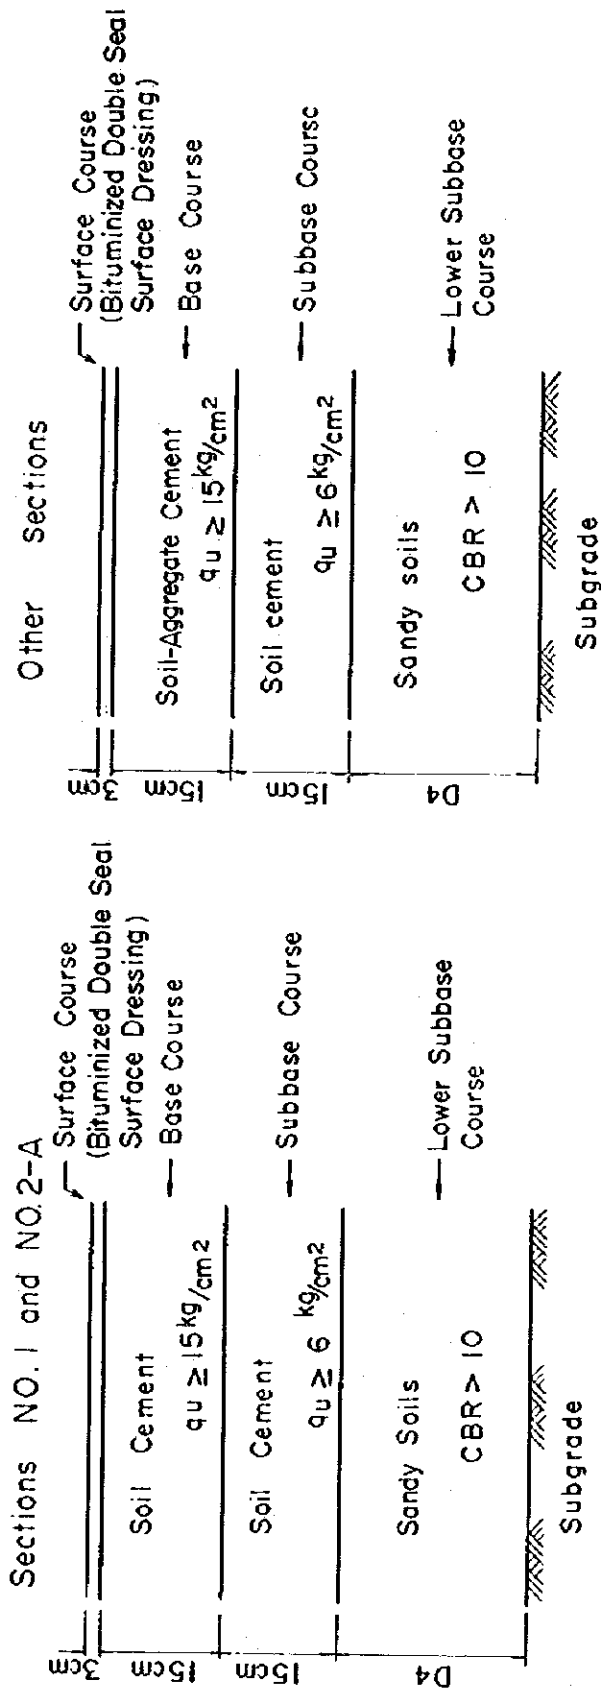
PAVEMENT CROSS SECTION FOR STAGE CONSTRUCTION
